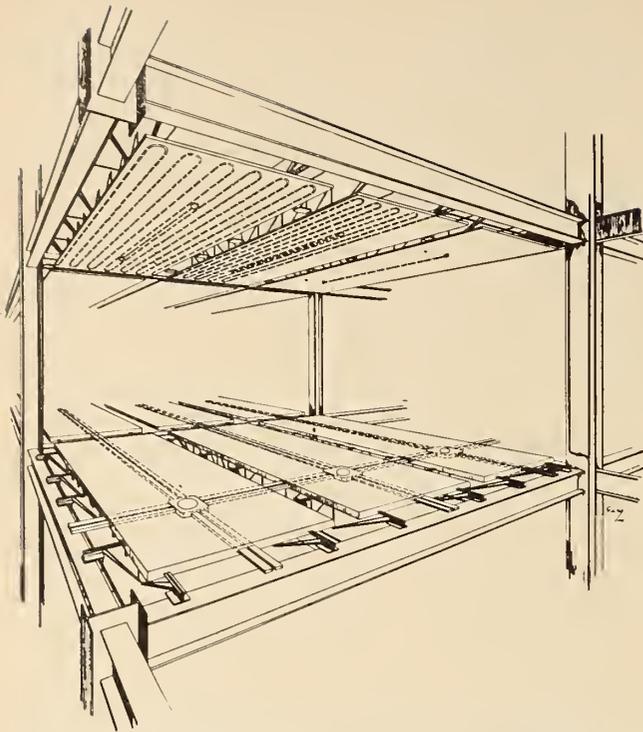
Typical installation of the prefabricated panels in place on the structural steel of an office building.
